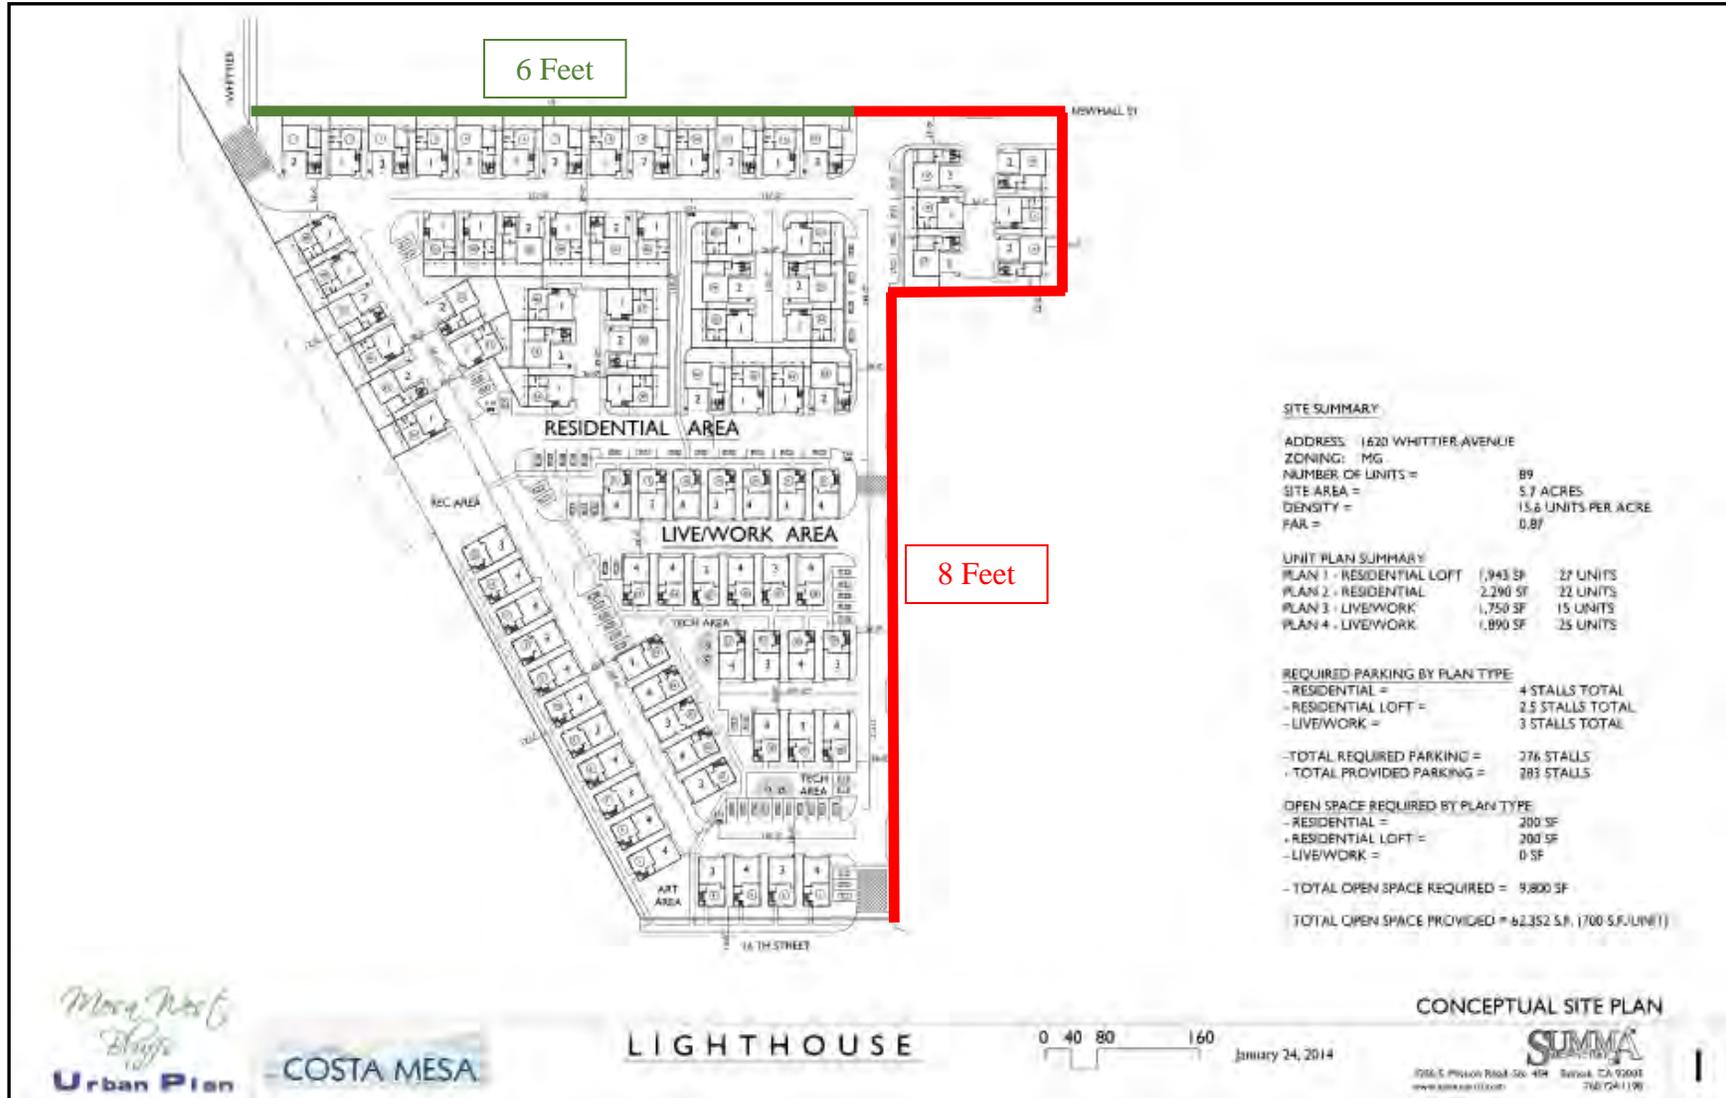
Location of the Planned 8-Foot and 6-foot Perimeter Walls
